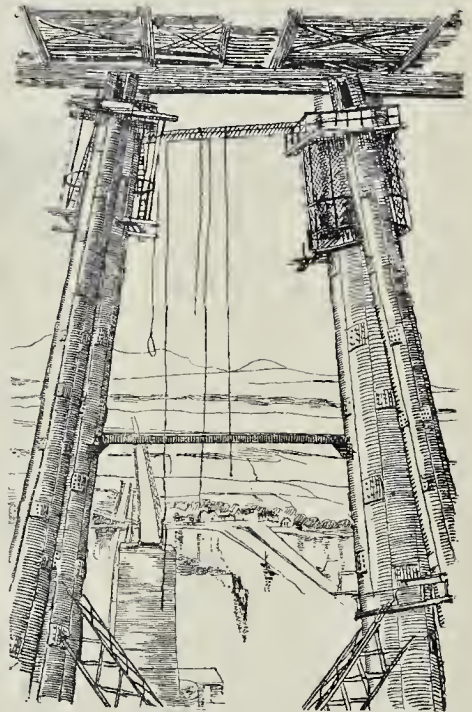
Near the Top of the Queensferry Pier, looking down on Masonry Pier and Viaduct.
